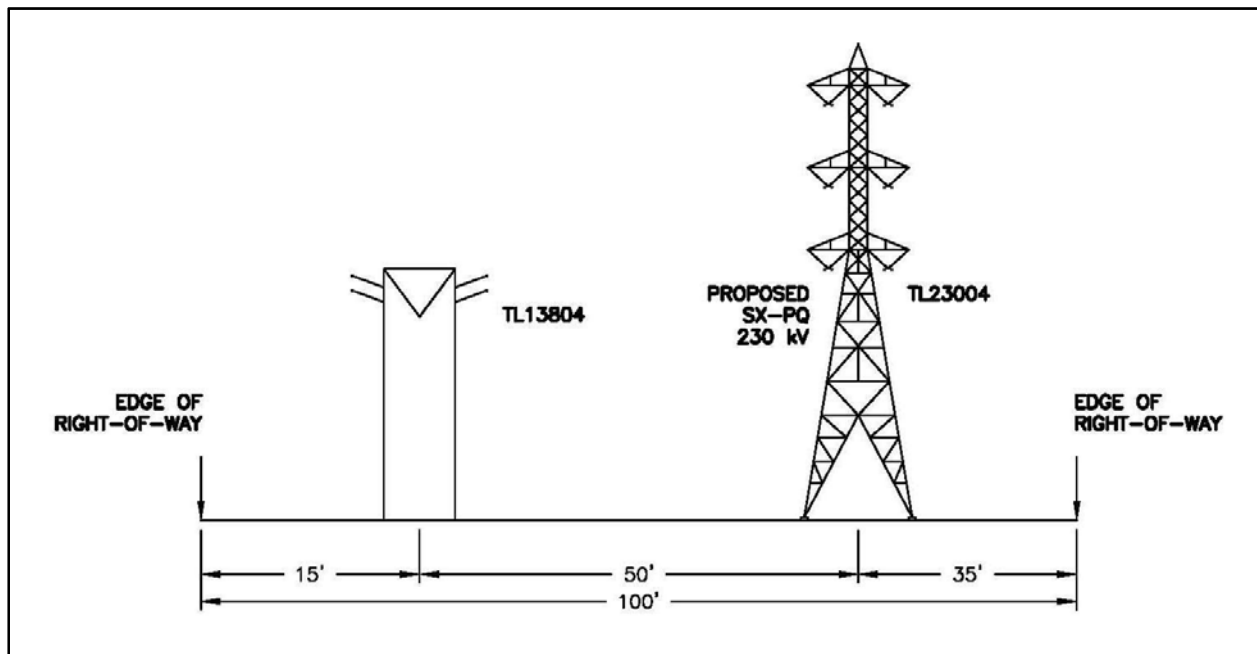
Segment C Proposed ROW Cross Section (View North)
